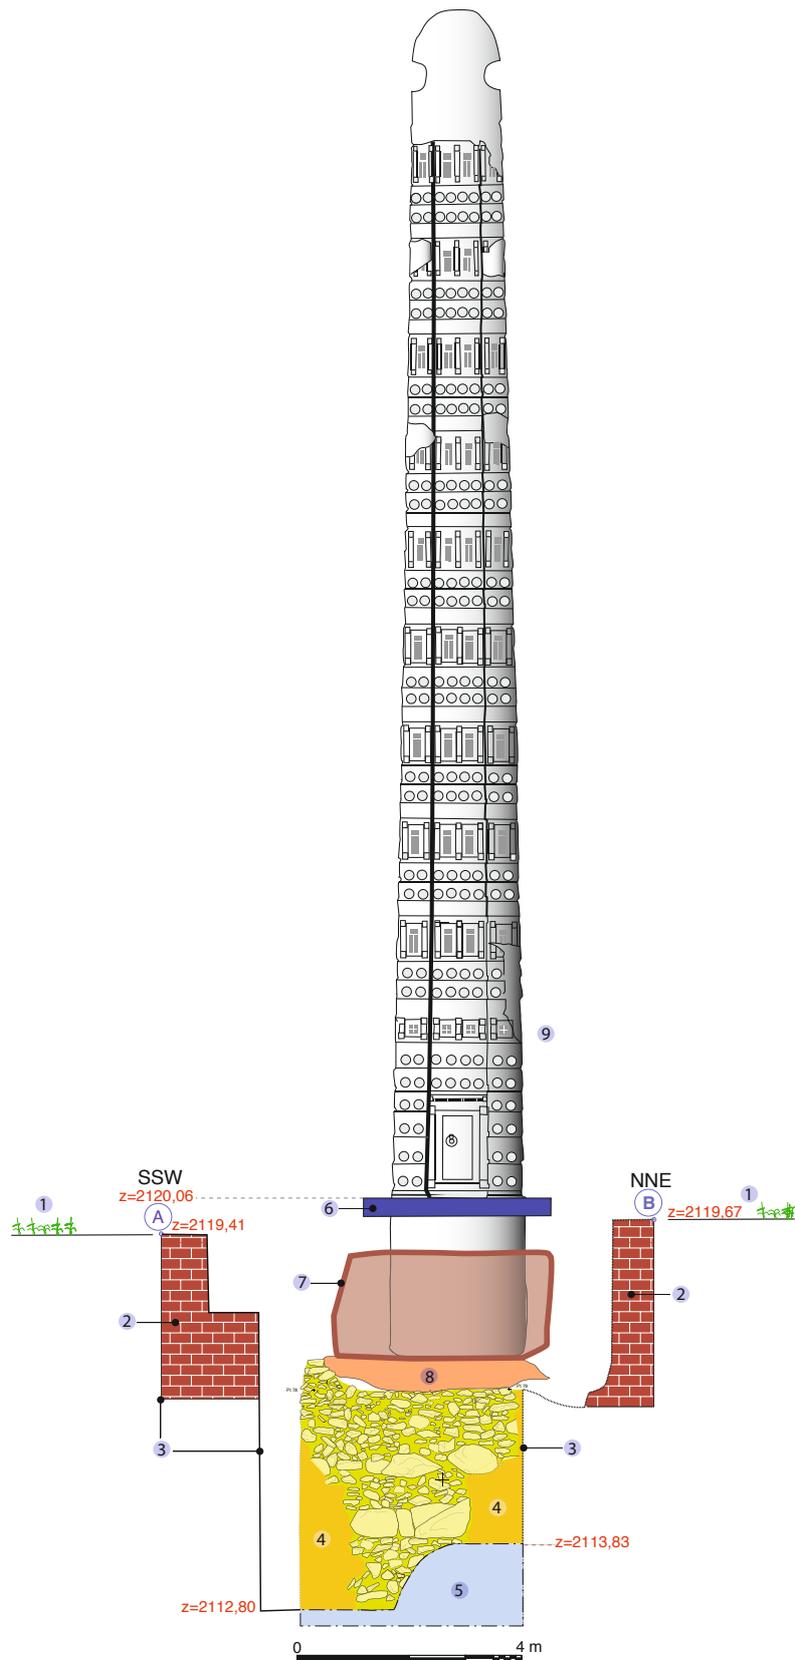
Original location of Stela 2: section AB (SSW-NNE). 1: Current ground level; 2: contemporary support wall; 3: boundary of the excavation; 4: not detailed; 5: resistant substrate; 6: base plate; 7: wedge slab; 8: "footing slab"; 9: Stela 2 redrawn (after Littmann *et al.*, 1913; the altitudes are given in metres above sea-level; topography: L. Fadin, CFEE; drawing: J.-M. Bryand and B. Poissonnier, CFEE; synthesis: B. Poissonnier, CFEE).
